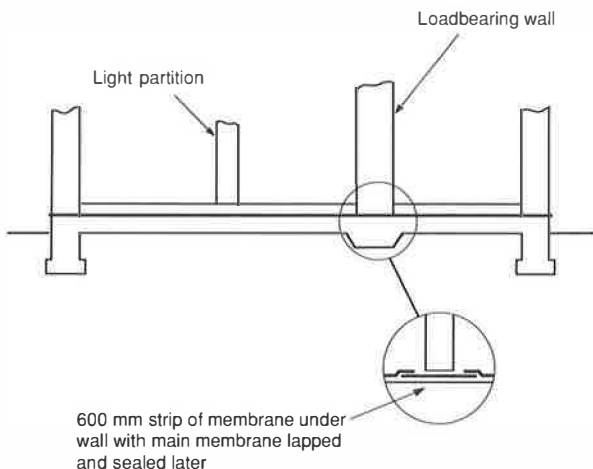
Avoidance of breaking the radon-proof barrier beneath internal walls
